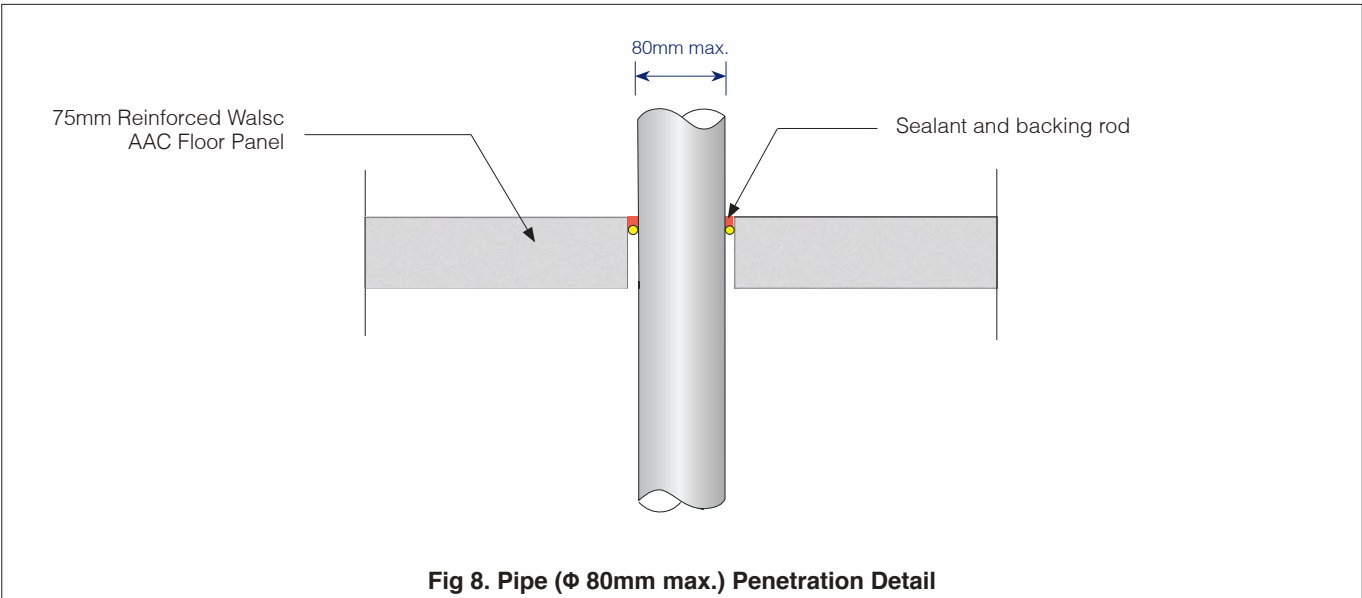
Pipe (Φ 80mm max.) Penetration Detail
